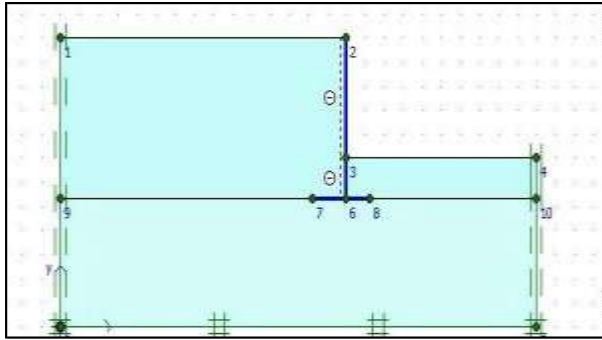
Geometry of cantilever retaining wall in Plaxis 2D
